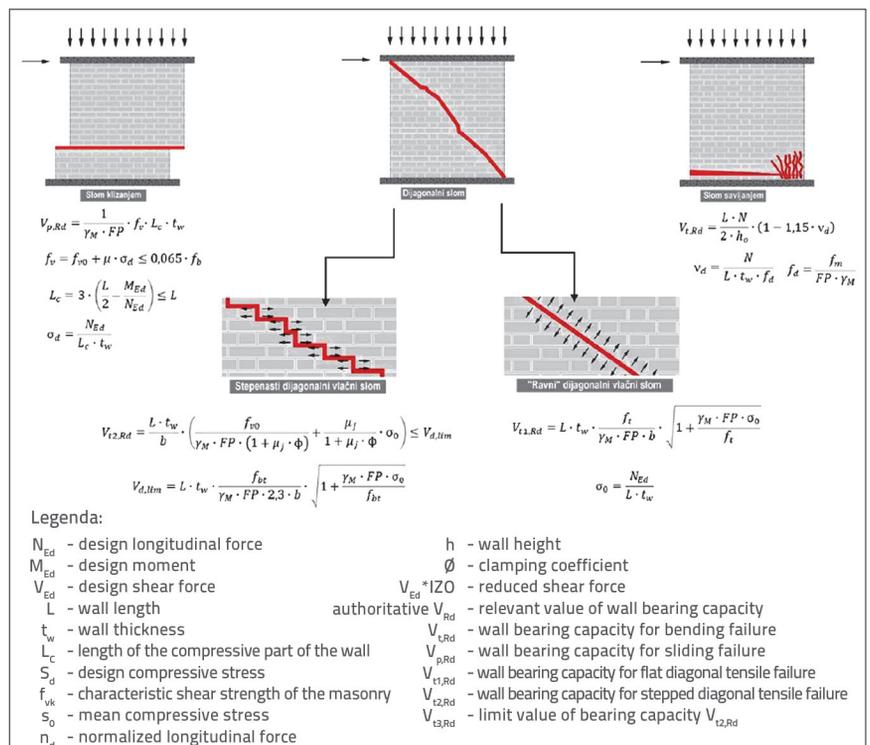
Expressions for in-plane failure modes of existing masonry [11]
